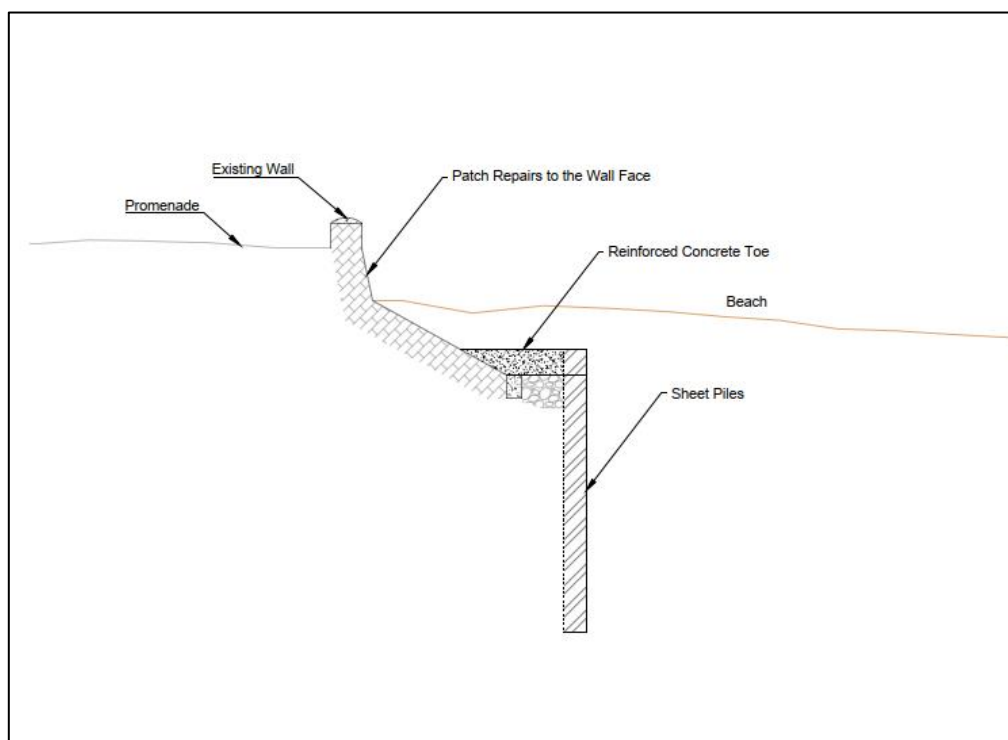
Concept sketch of Sheet Piling Toe Protection option
